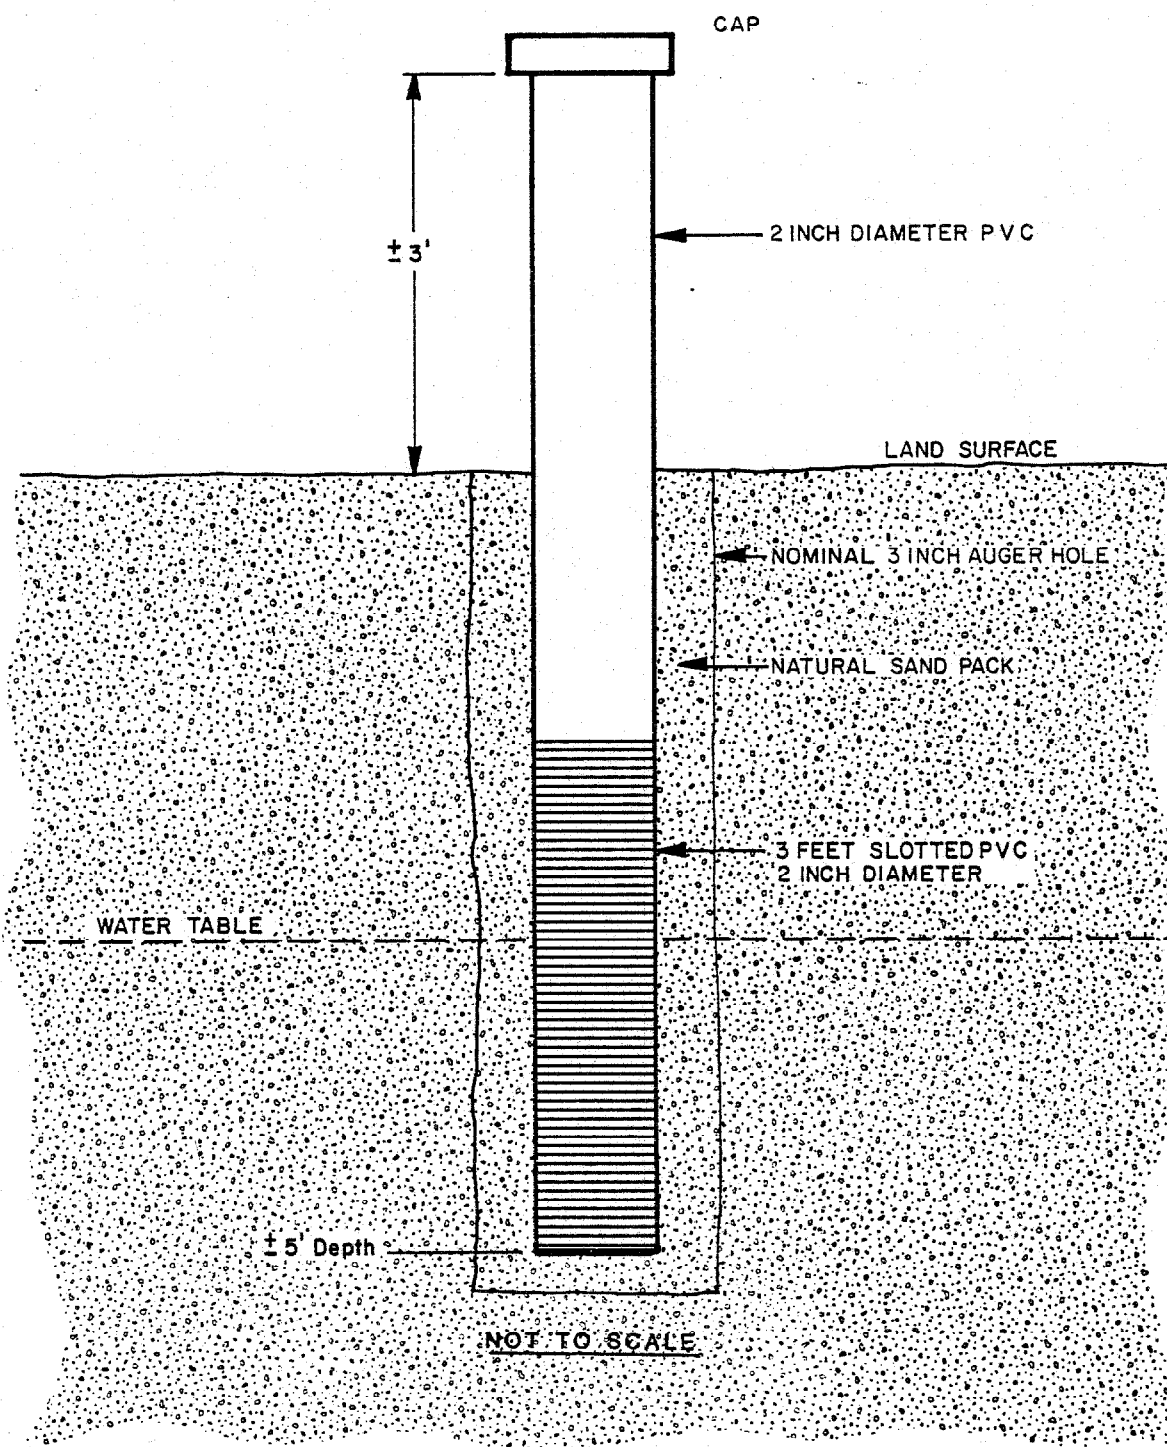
Schematic Diagram Showing the Typical Construction Details of Monitor Wells Installed at Gas Hill.
